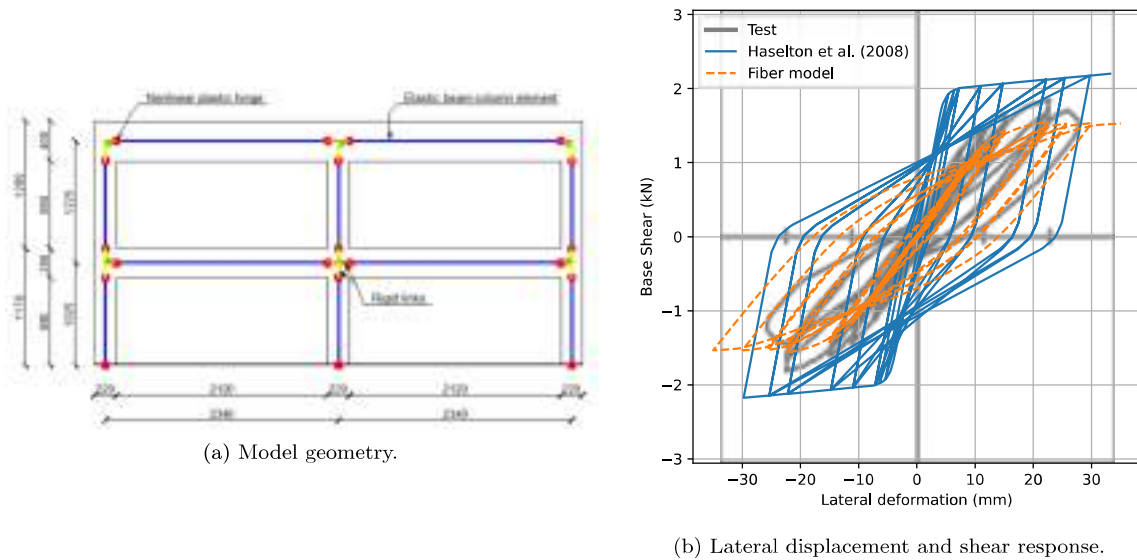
Example modelling of a building frame tested by Adachi et al. (2000).
